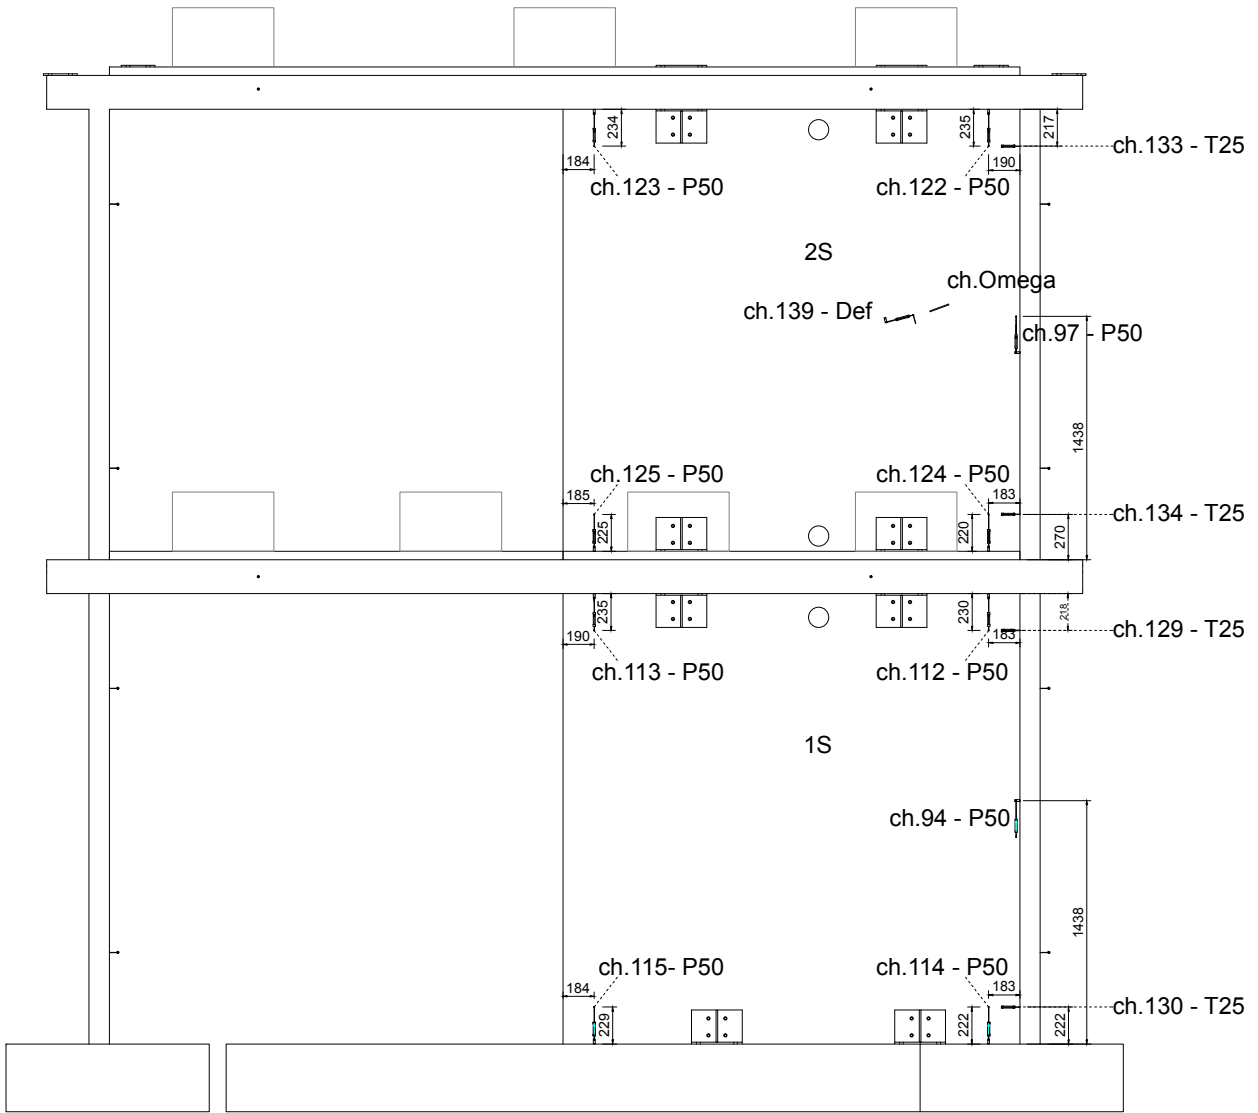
Installed instrumentation: side views of the specimen – Stability walls, West.
